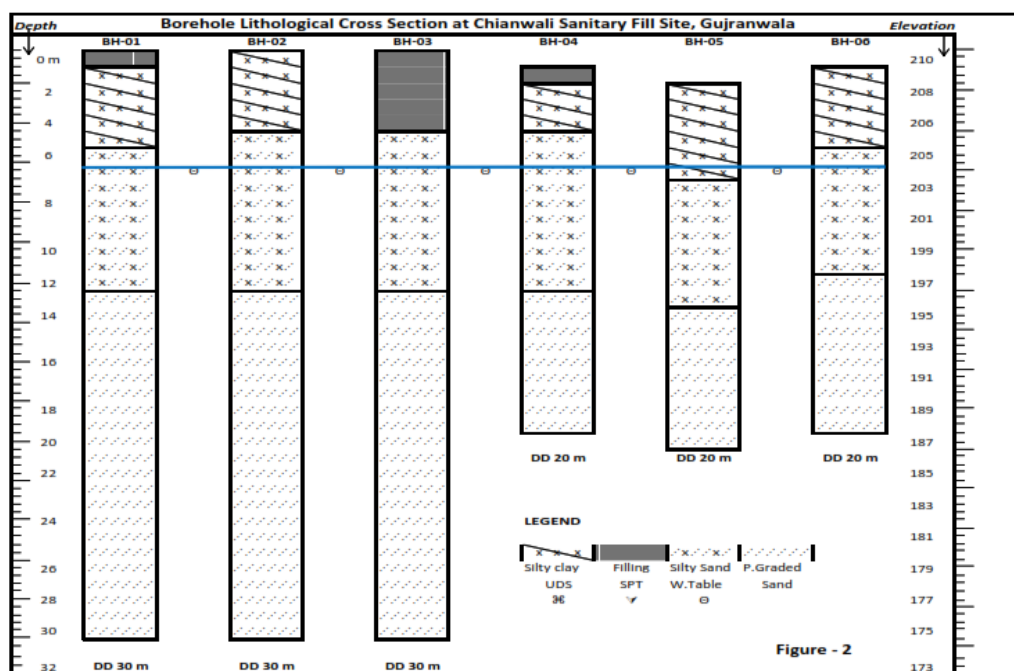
Boring Logs at Chianwali Former Disposal Site
